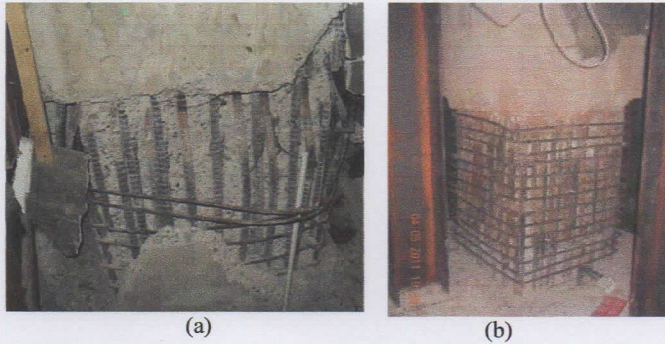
Retrofitting of damaged column outside core area - damaged column (a); additional confinement (b).
